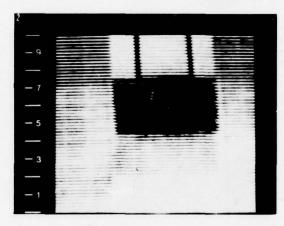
Thermal patterns in wooden panels separating first and second deck windows.
